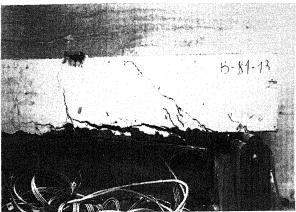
Failure pattern of beam, strengthened by epoxy bonded plate
